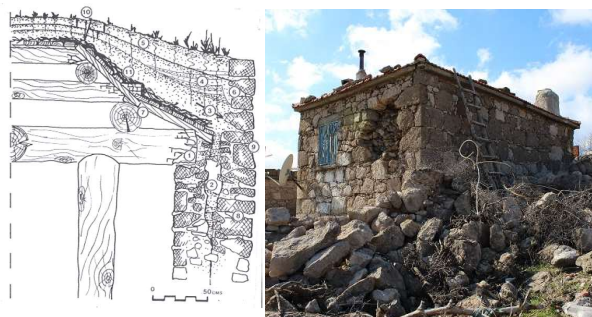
Typical wall construction detail (Hughes, 2000) and typical view of the dwelling from the region
